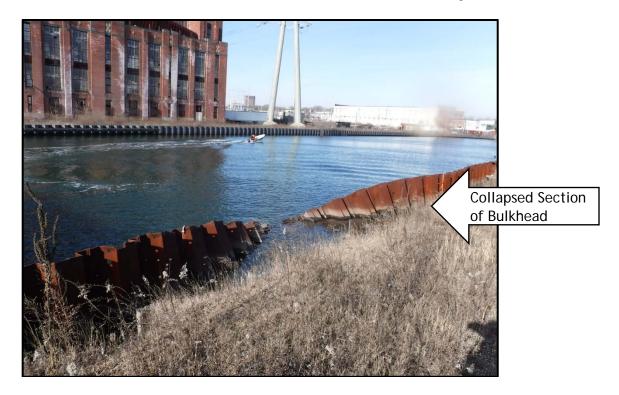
Steel sheet pile bulkhead along Gateway Terminal, looking northwest, photo taken January 8, 2016.
